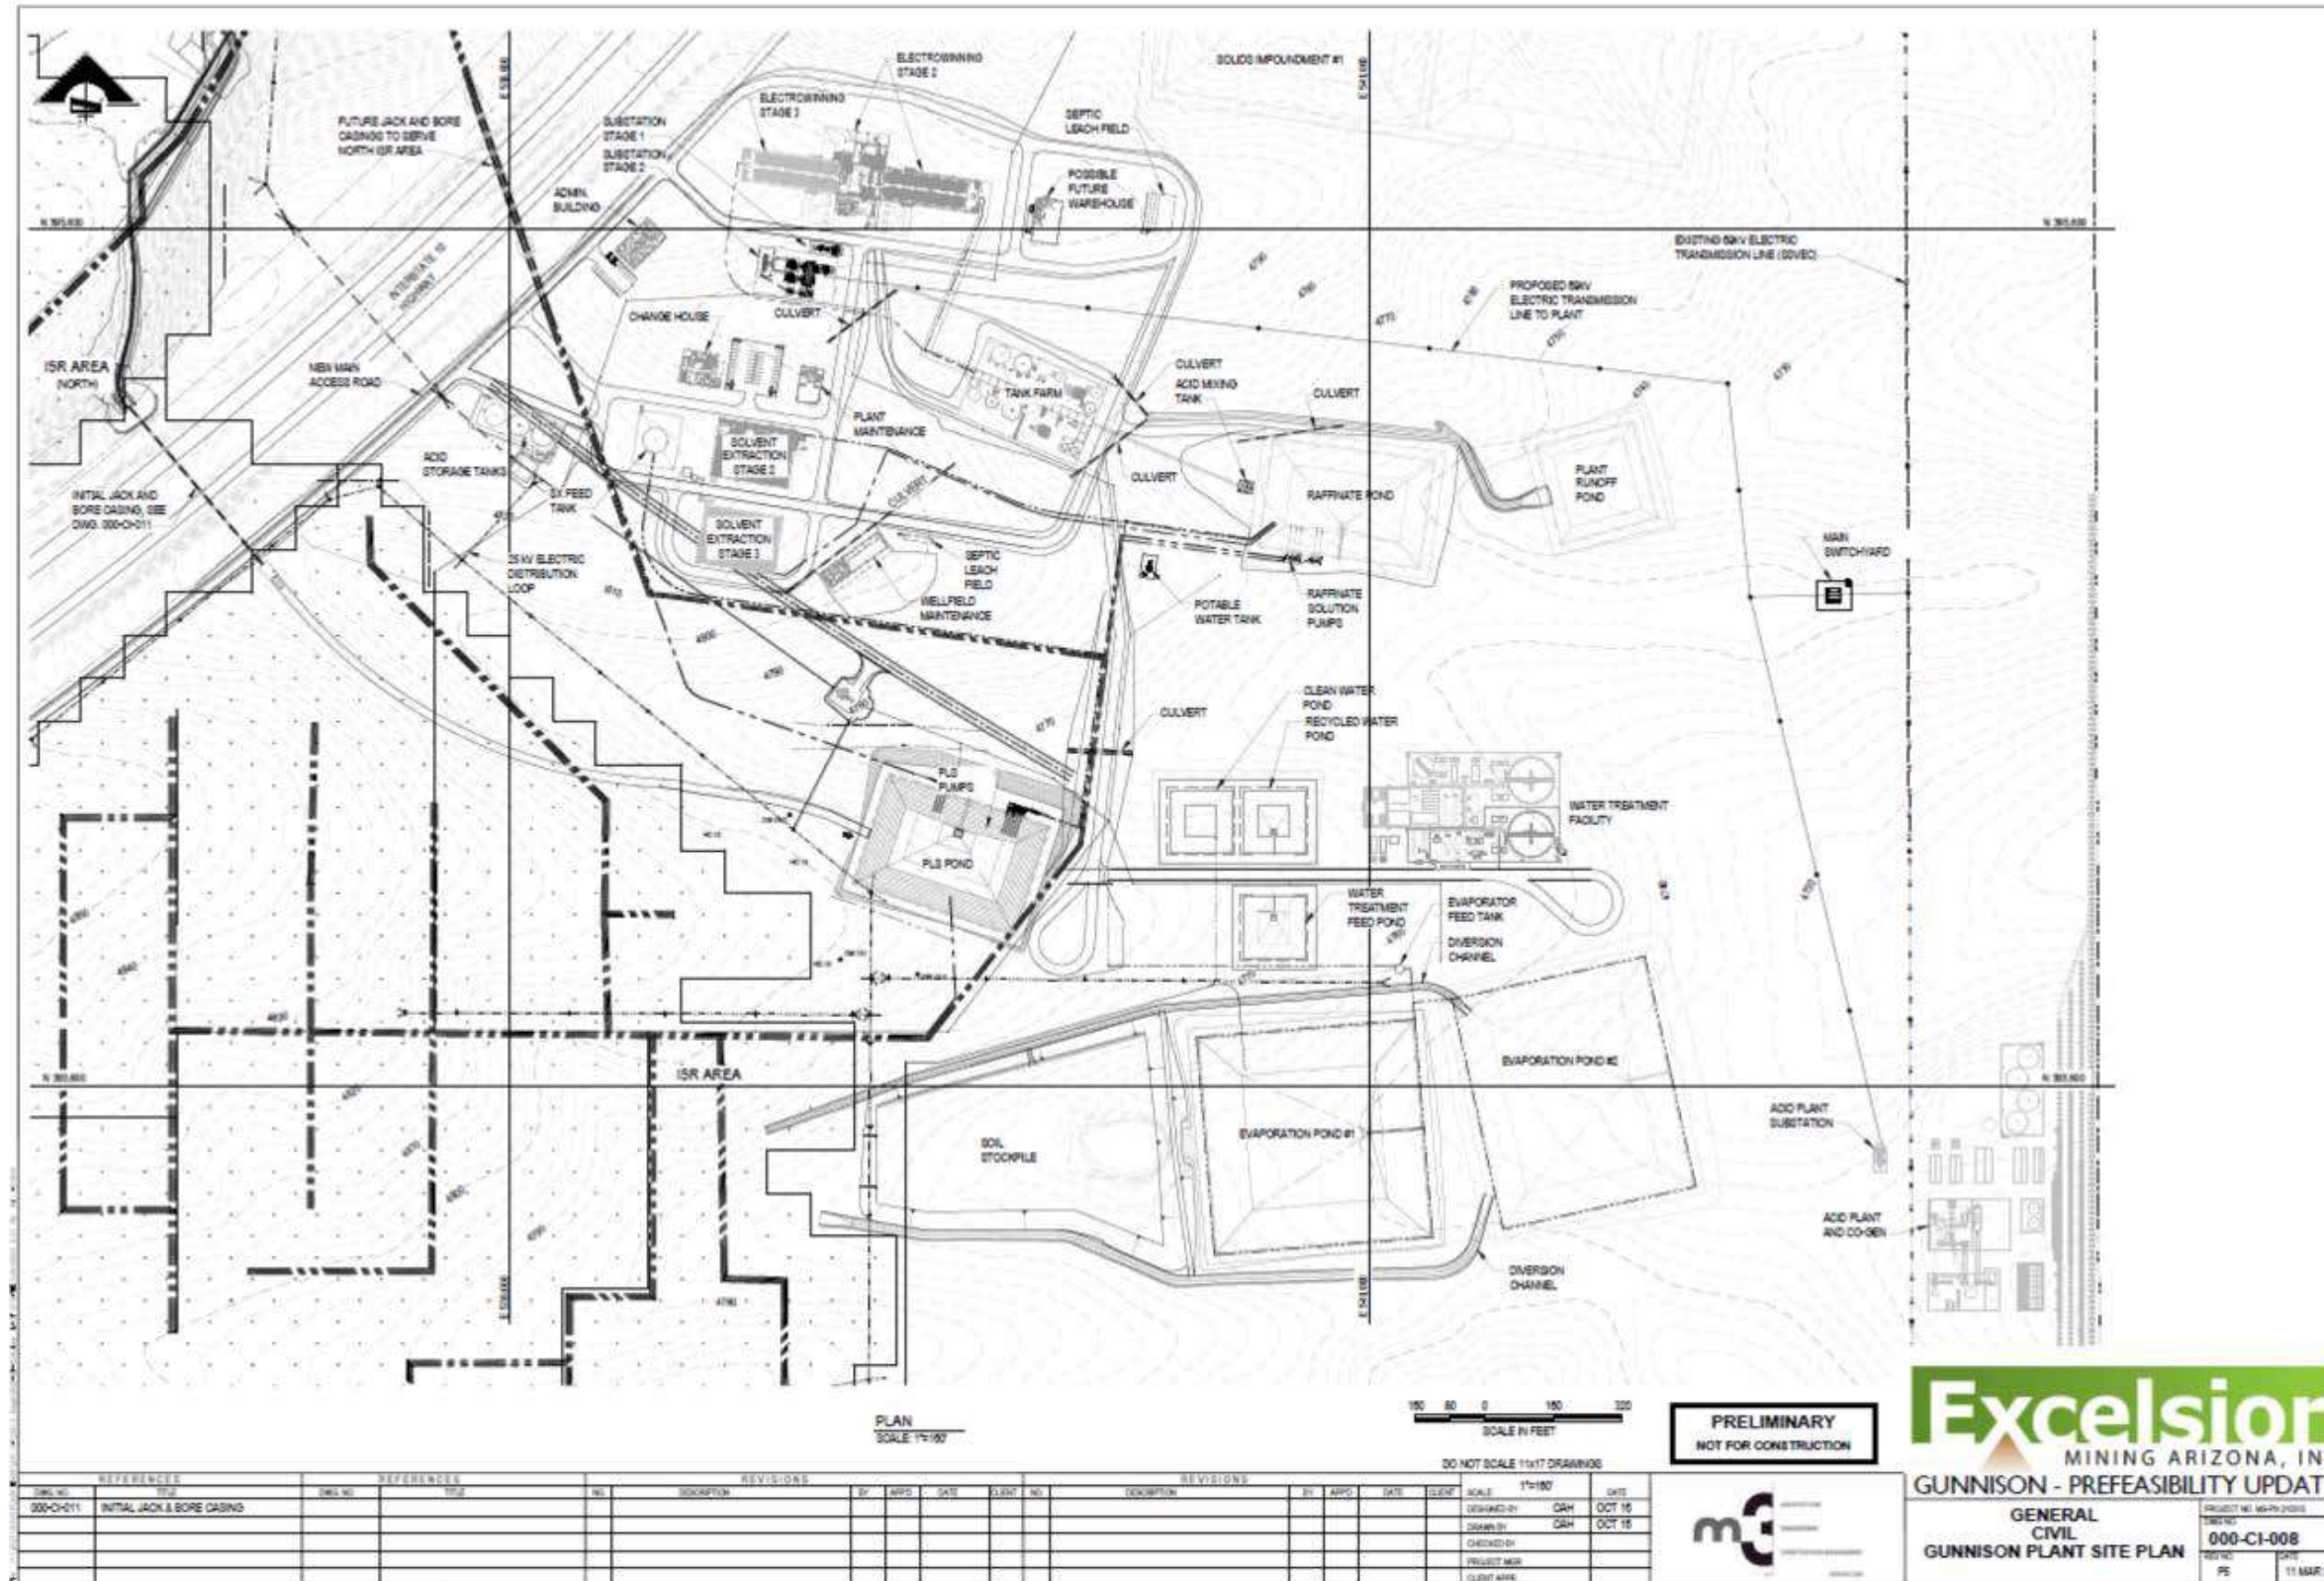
Site Plan of Stage 2 and 3 Facilities and Infrastructure
